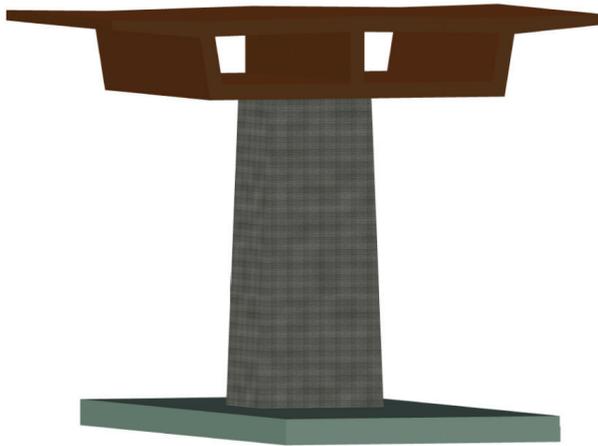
High narrow pillar of a bridge over the valley (*by MJ*)
